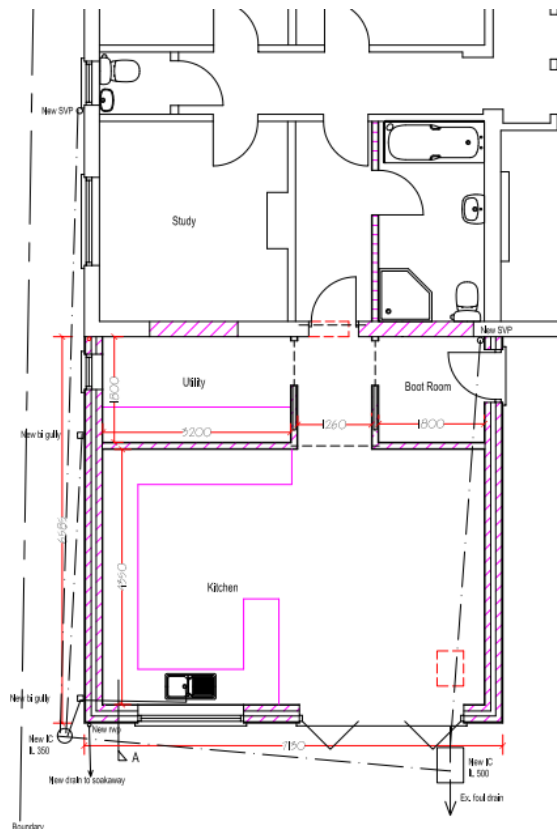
Fig B: Proposed Floor Plan - snippet (4/01366/15/FHA - Thistledo)
